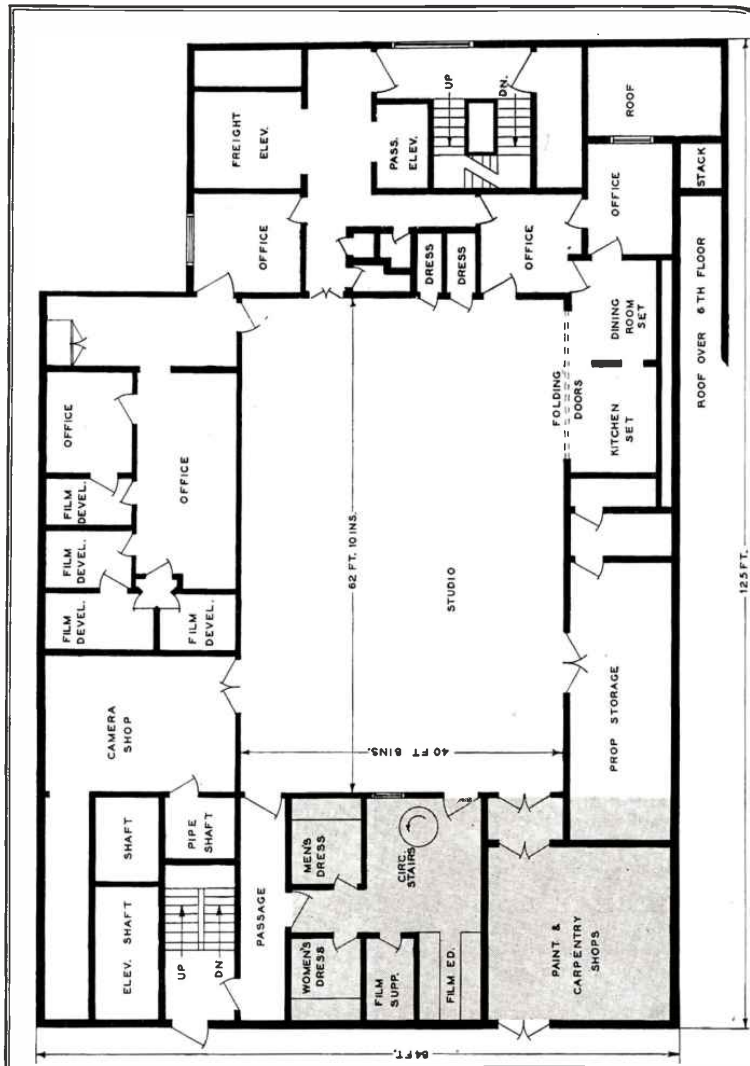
WHAS STUDIOS, OFFICES ON 7TH FLOOR OF DOWNTOWN BUILDING. TECHNICAL AREAS ARE ON MEZZANINE OVER SHADED SECTION
